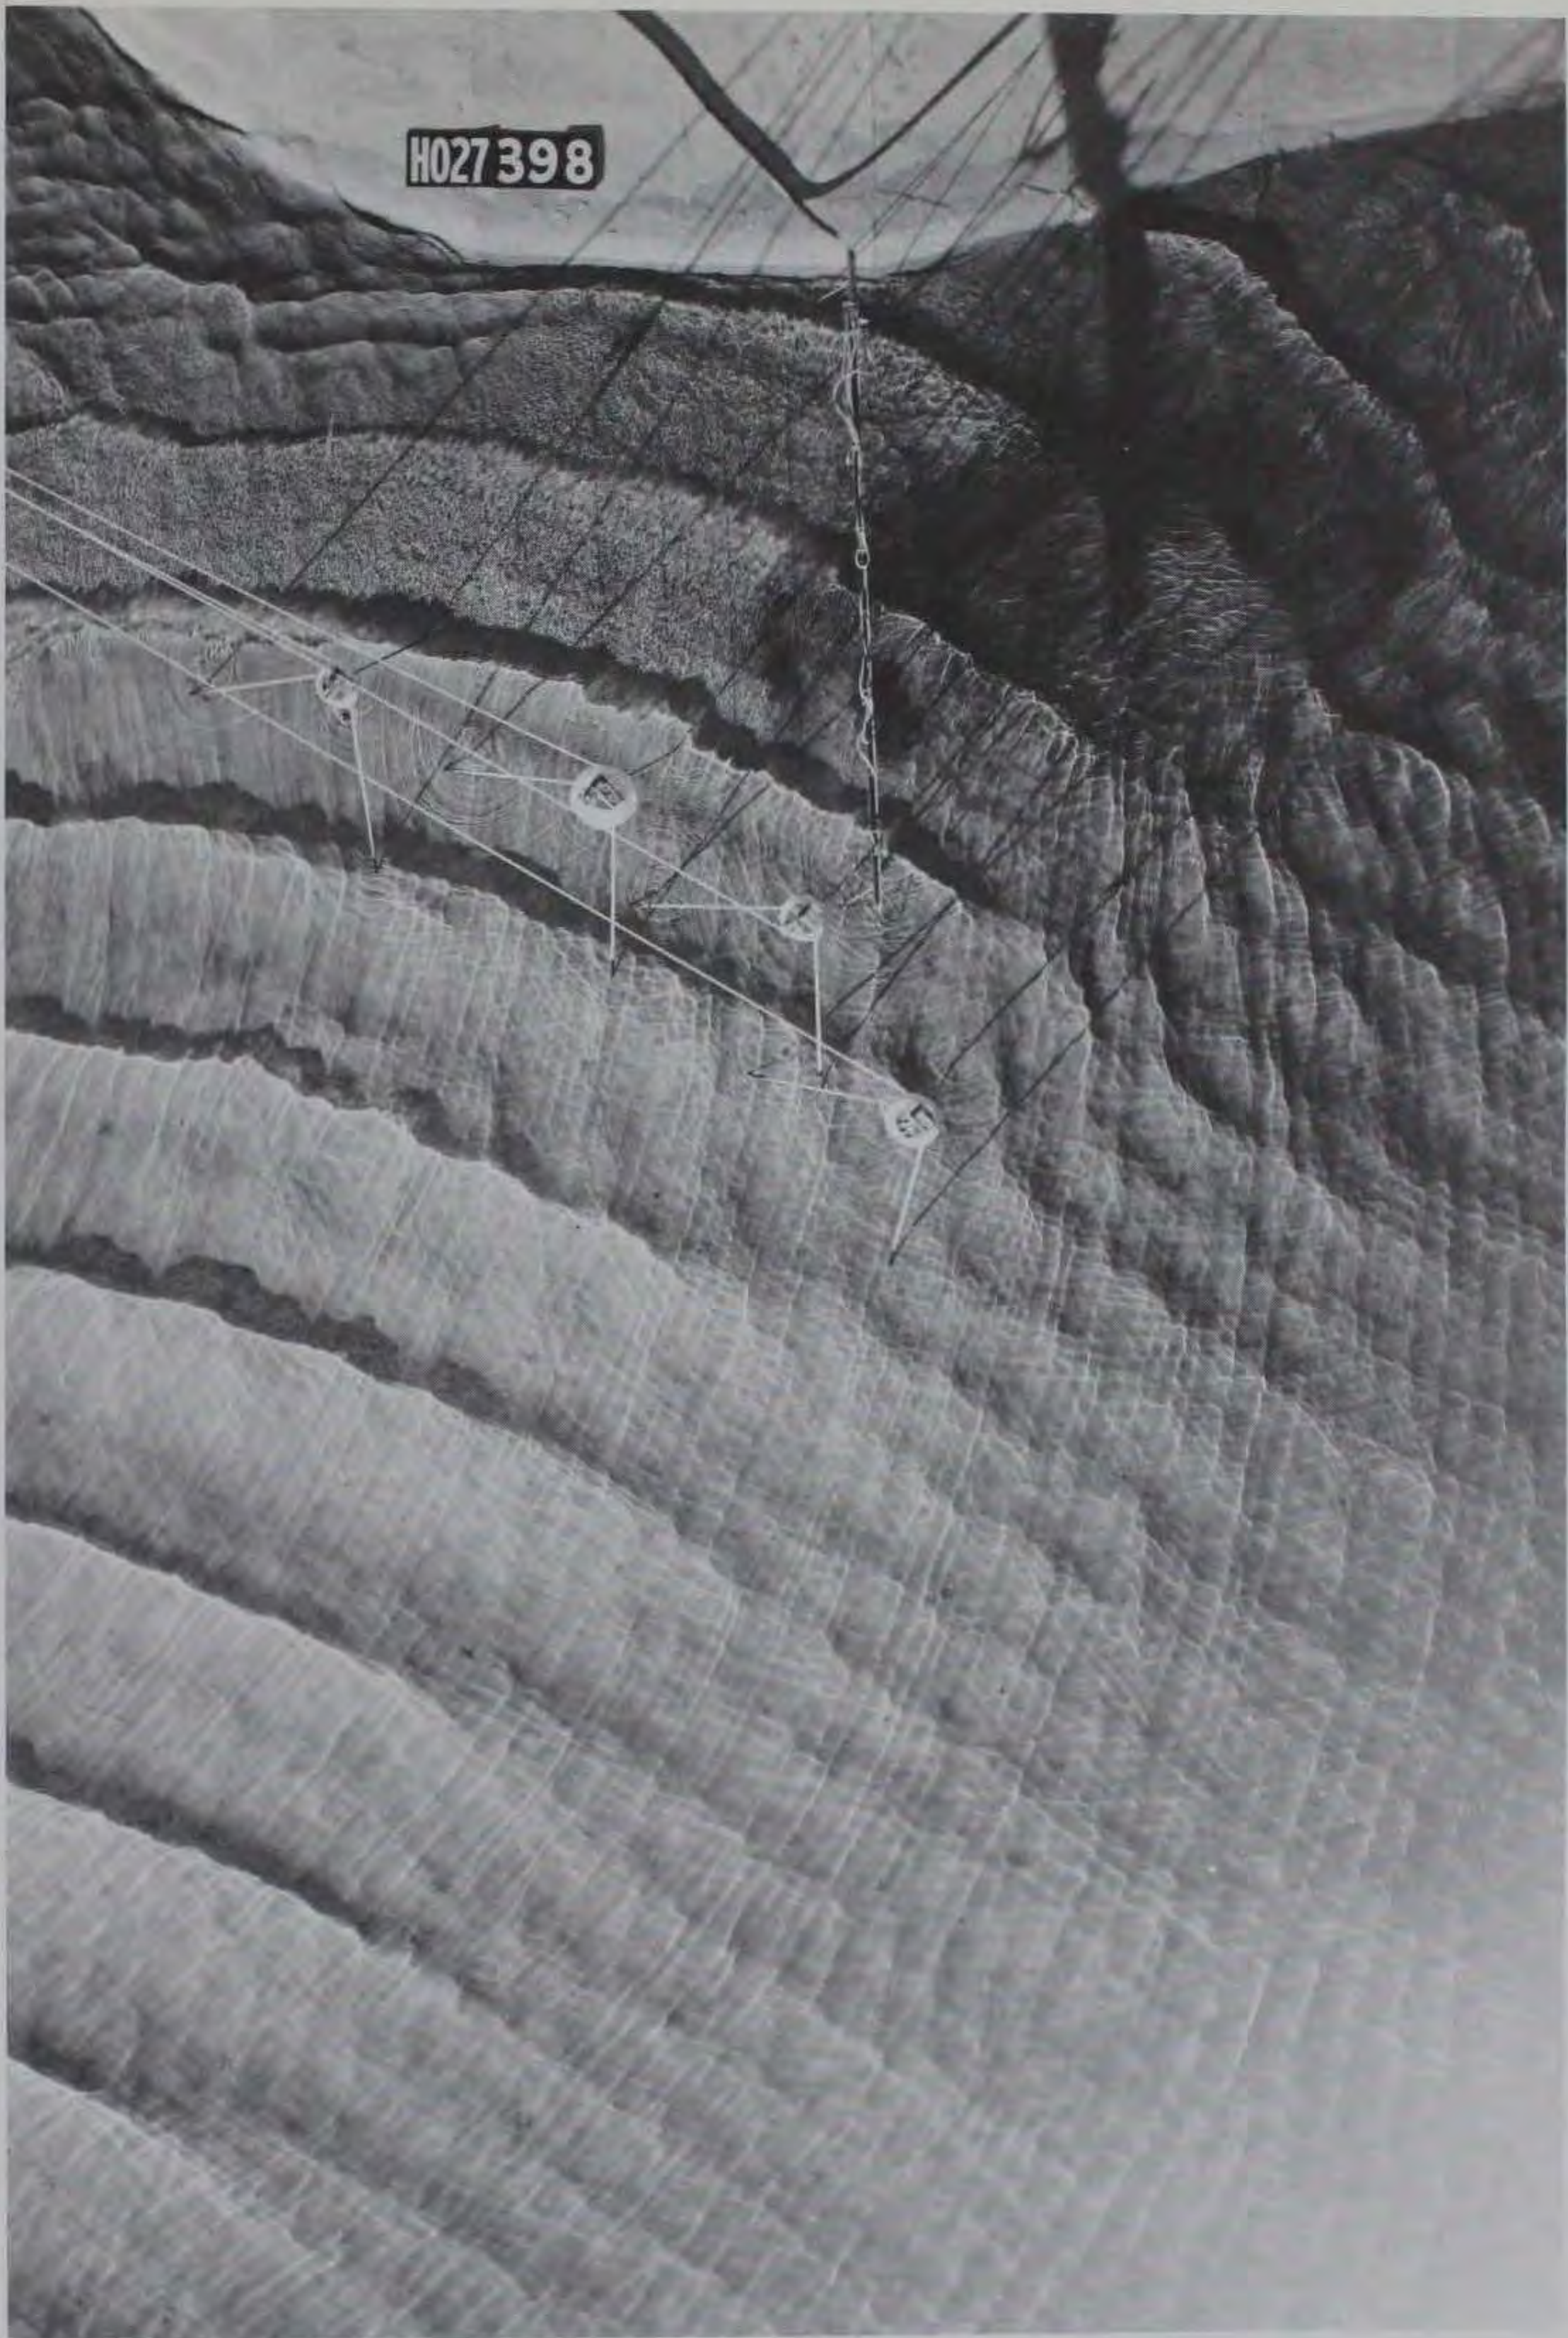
Test series II and III, north zone, S 22°30' E wave direction, slack tide, 10-sec wave period, 10-ft wave height, proposed breakwater installed
